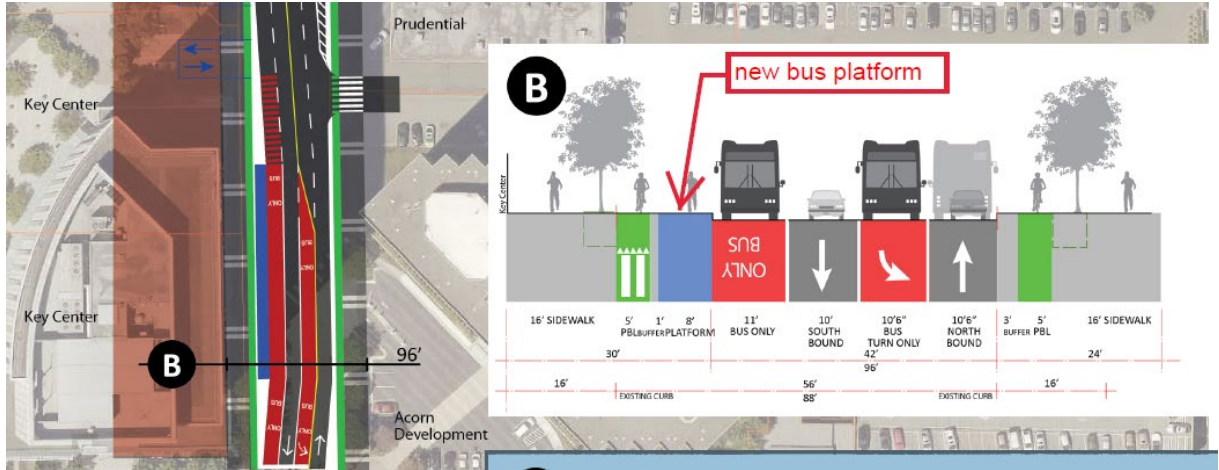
Proposed Street Section with new bus platform on west side of 108th Ave NE
